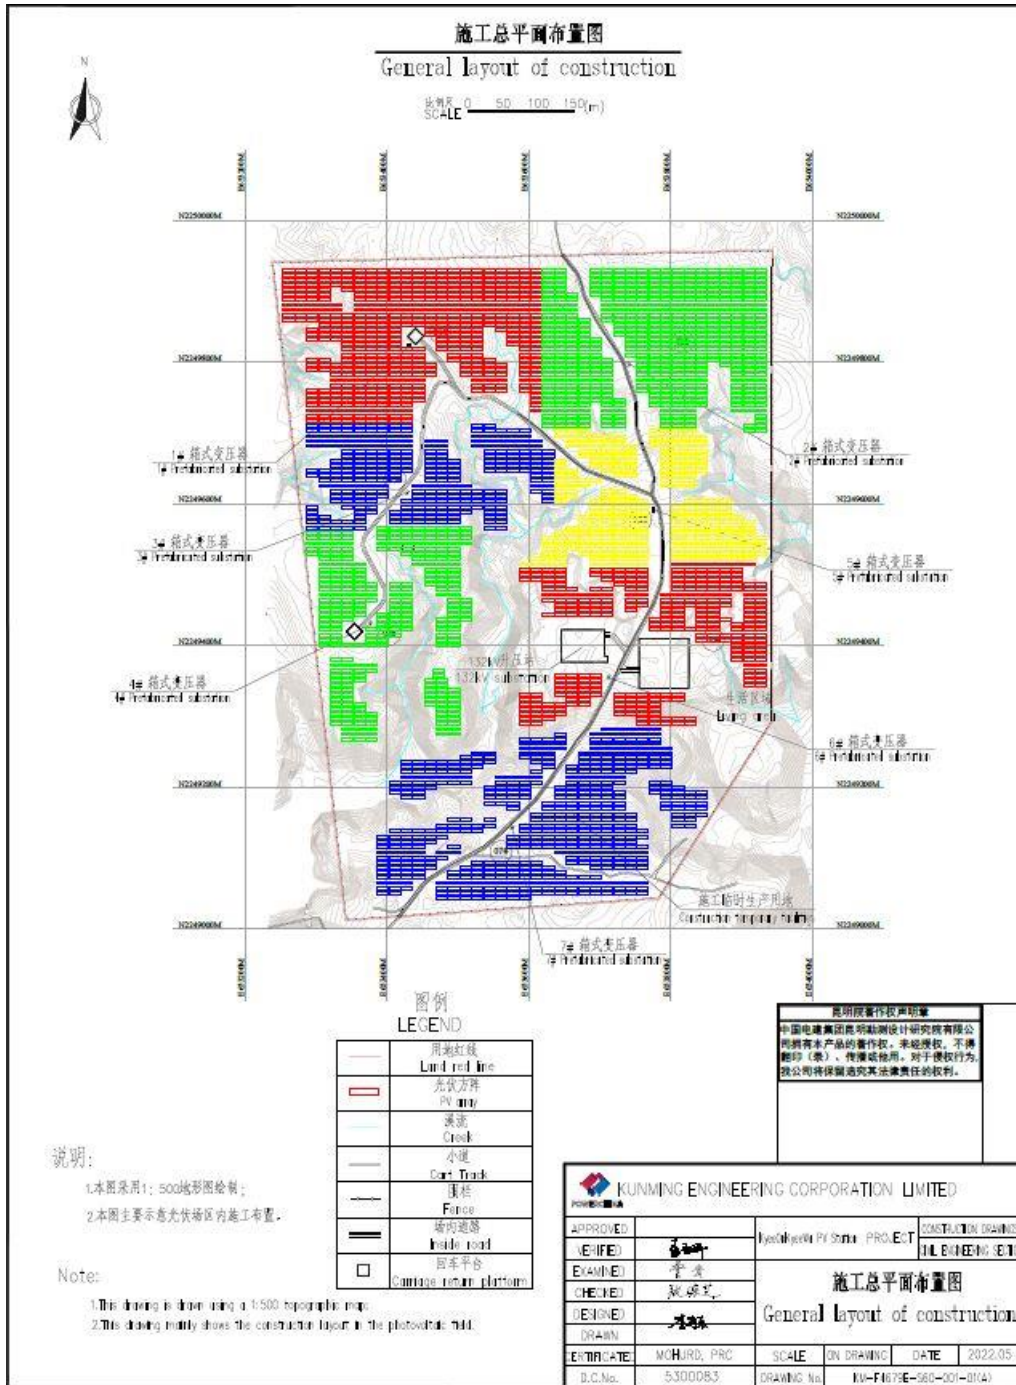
Proposed Layout of Kyeeonkyeewa PV Power Station
